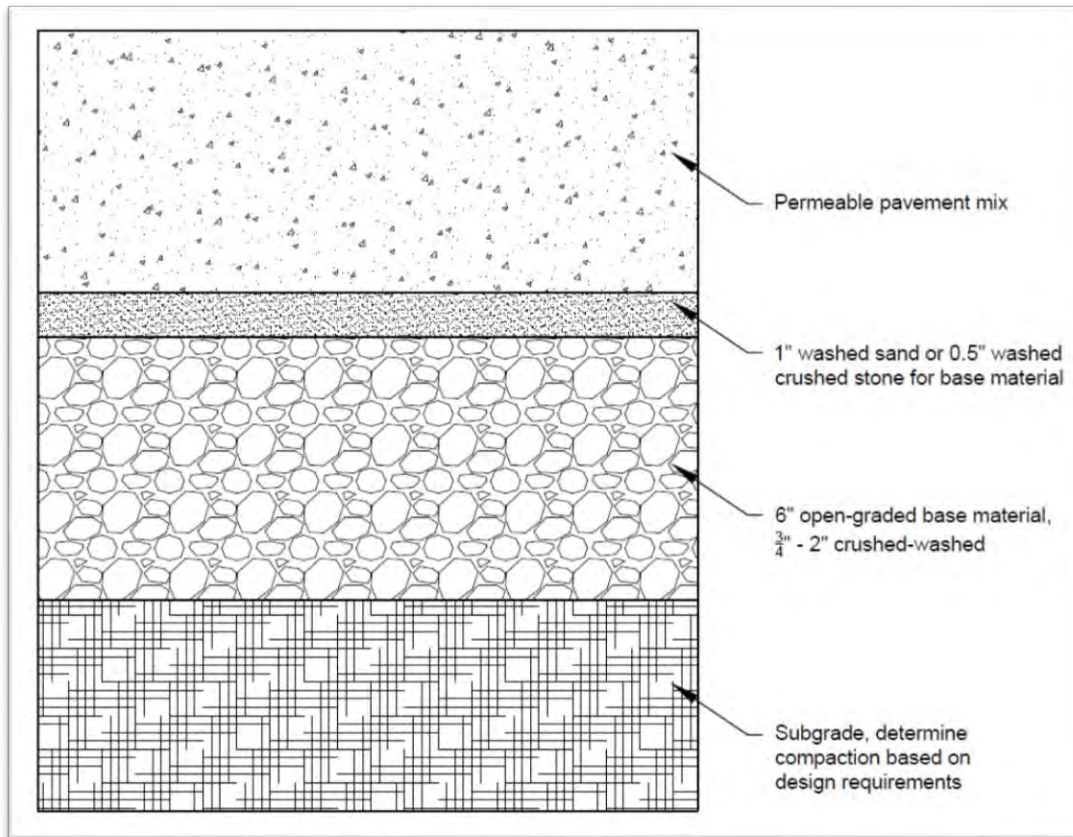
Typical pervious concrete cross-section (Ecology, 2014a).
